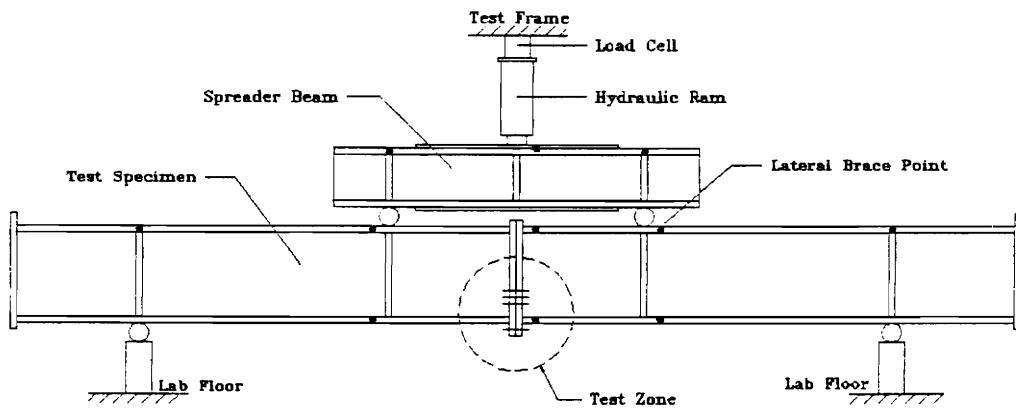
Longitudinal Elevation of Laboratory Test Setup
